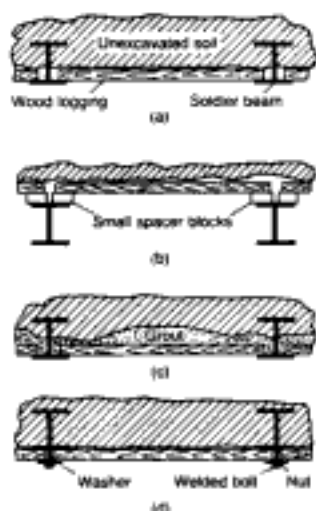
Methods of transferring earth pressure from lagging timbers to soldier piles in Berlin walls: (a) lagging wedged against inside flanges of soldiers; (b) lagging set behind flanges of soldiers; (c) grout or mortar filling between lagging and soil; (d) contact sheeting secured to face of soldiers (Peck¹)
